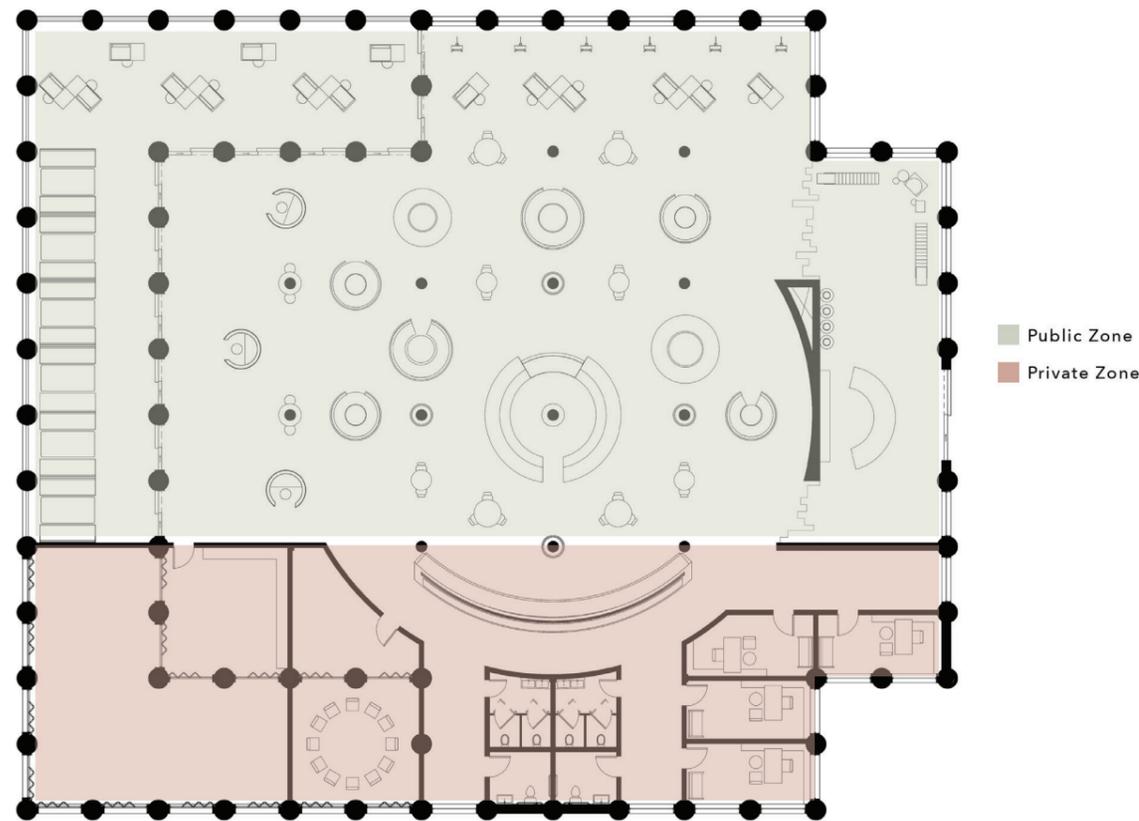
Malath Floor Plan Illustrating the Private and Public Zones
